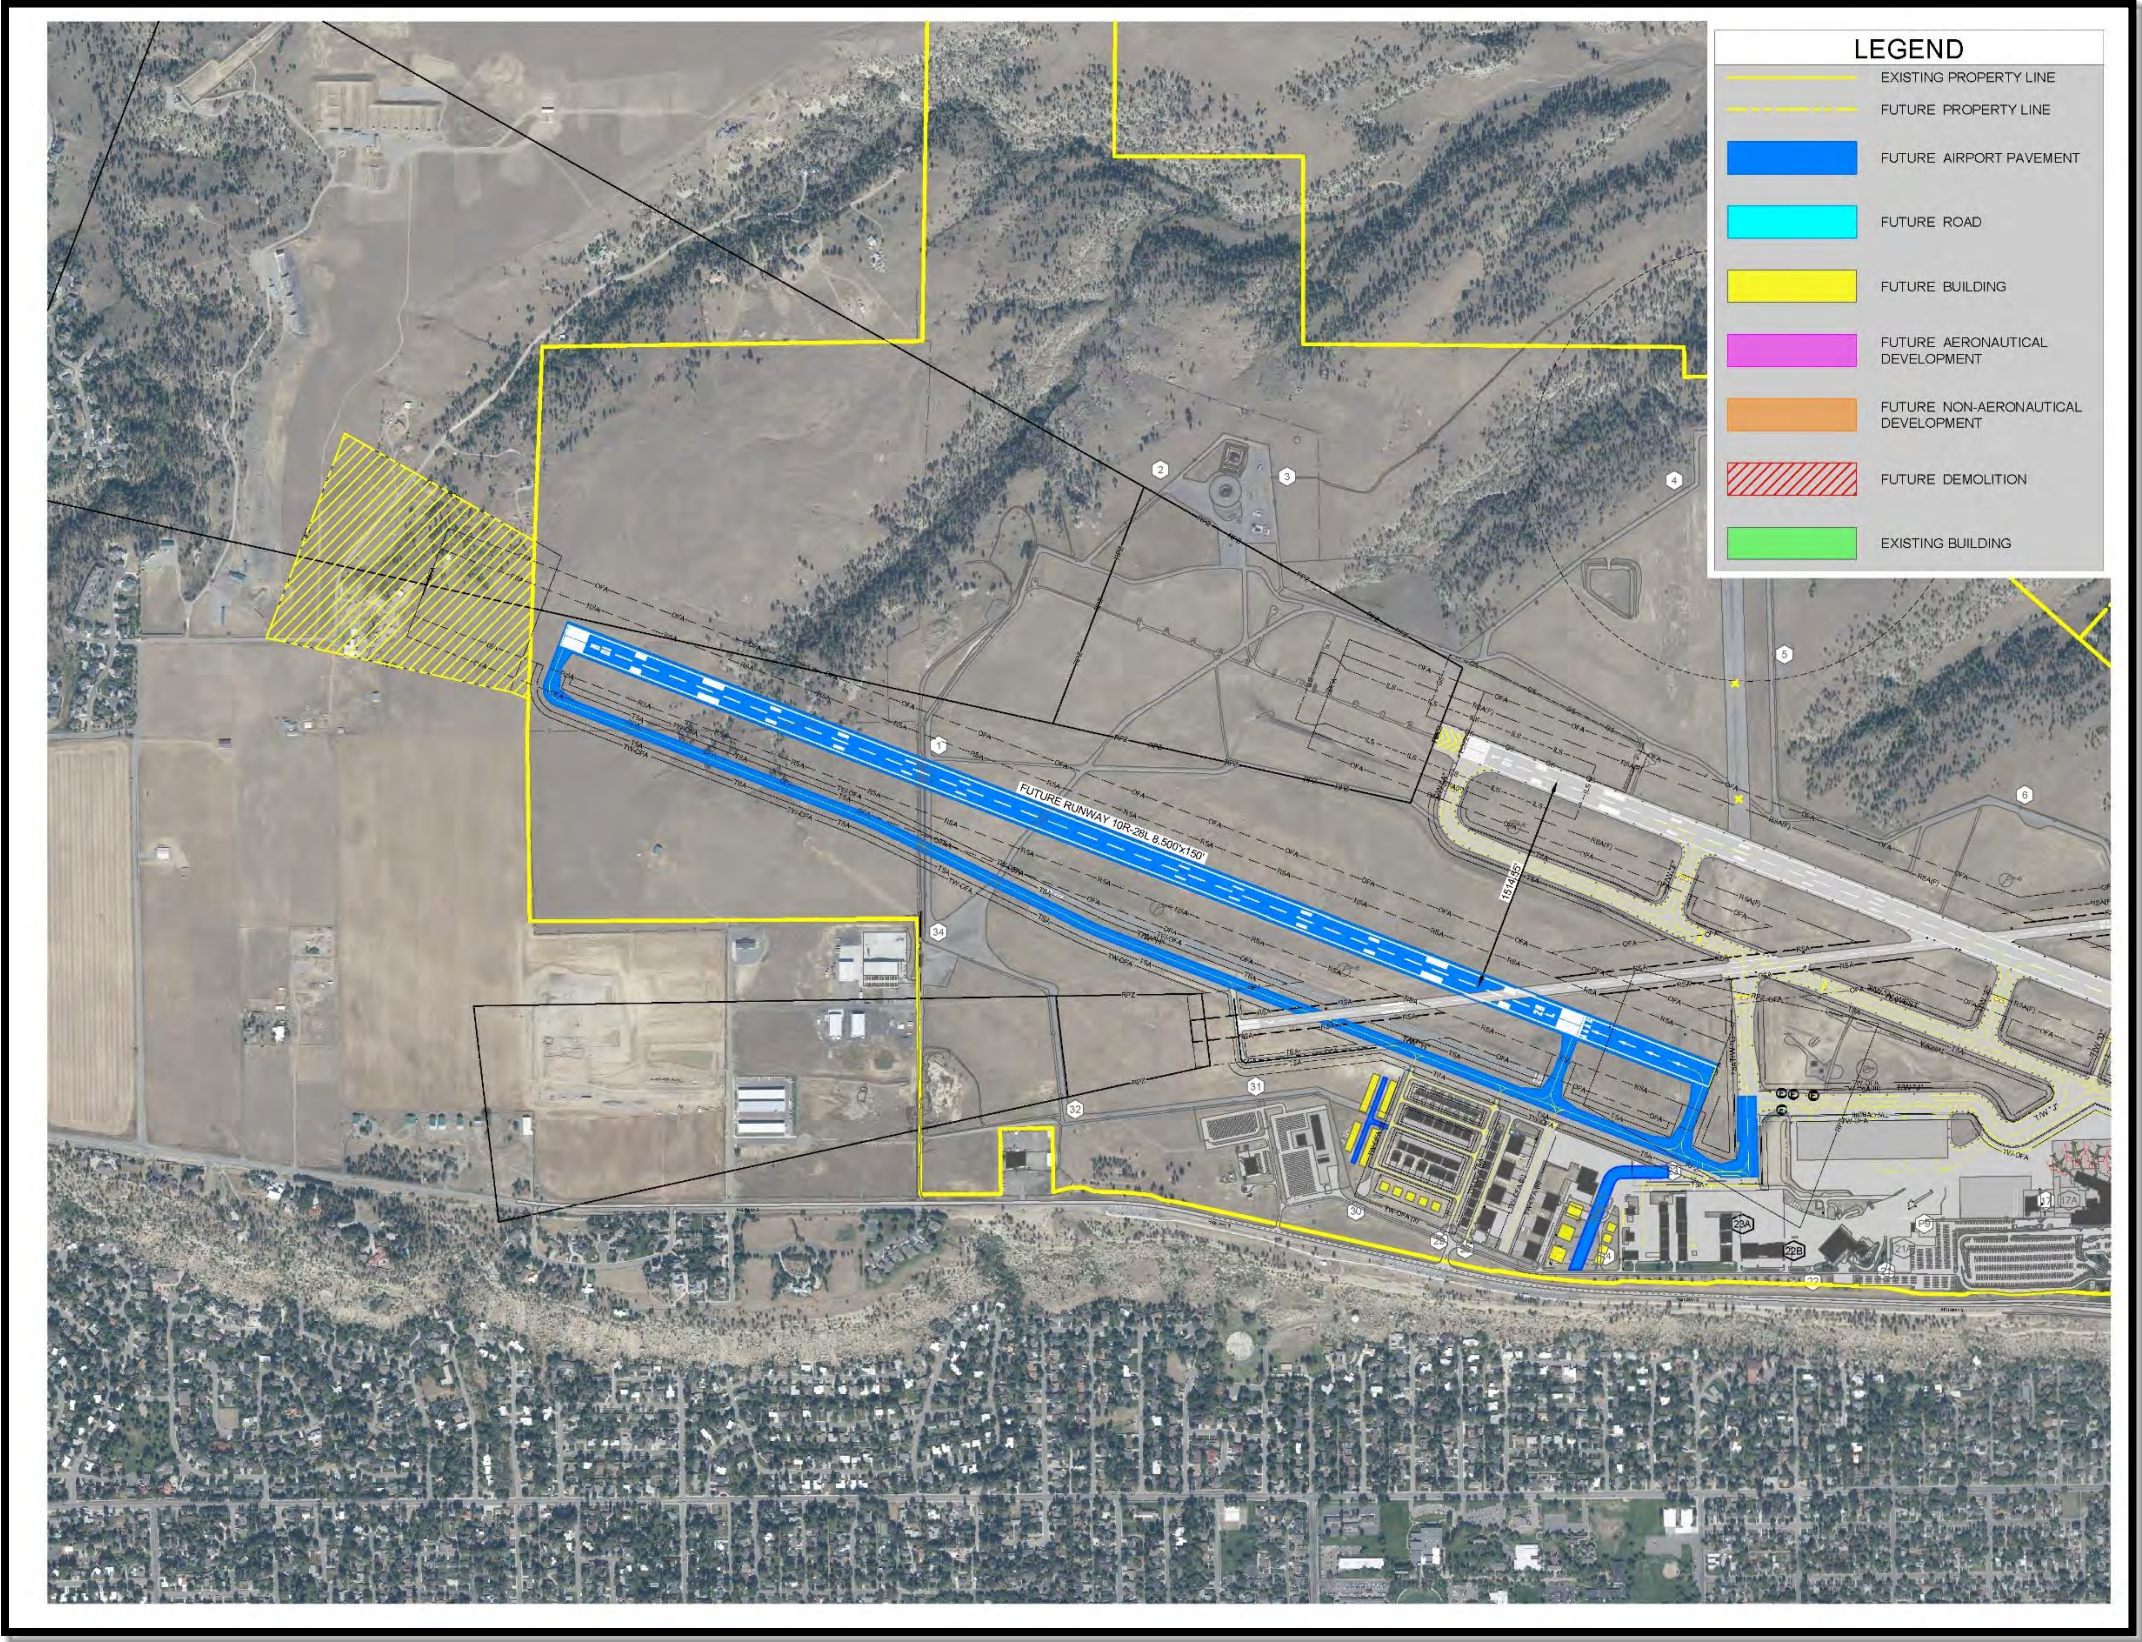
Parallel Runway Alternative B: 8,500 Feet Long
